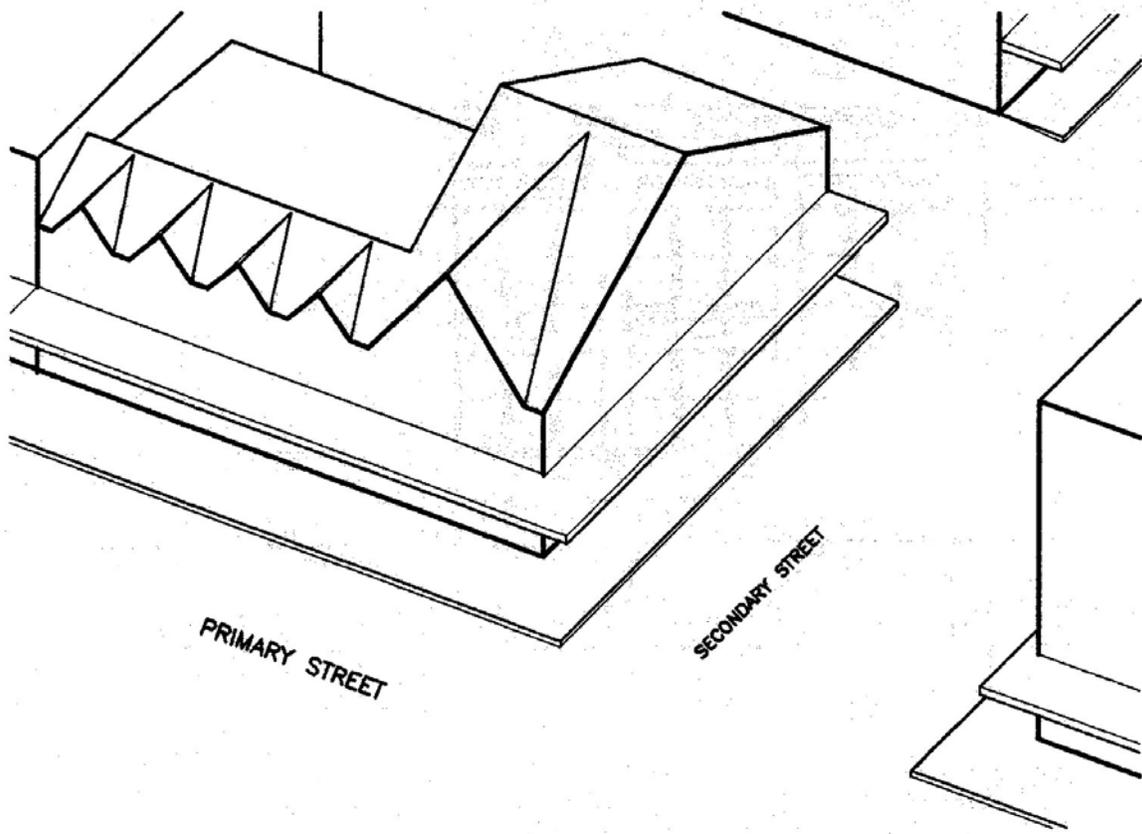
Increasing height at the corner allows a building to "hold the corner" and visually anchor the block at the intersection.
